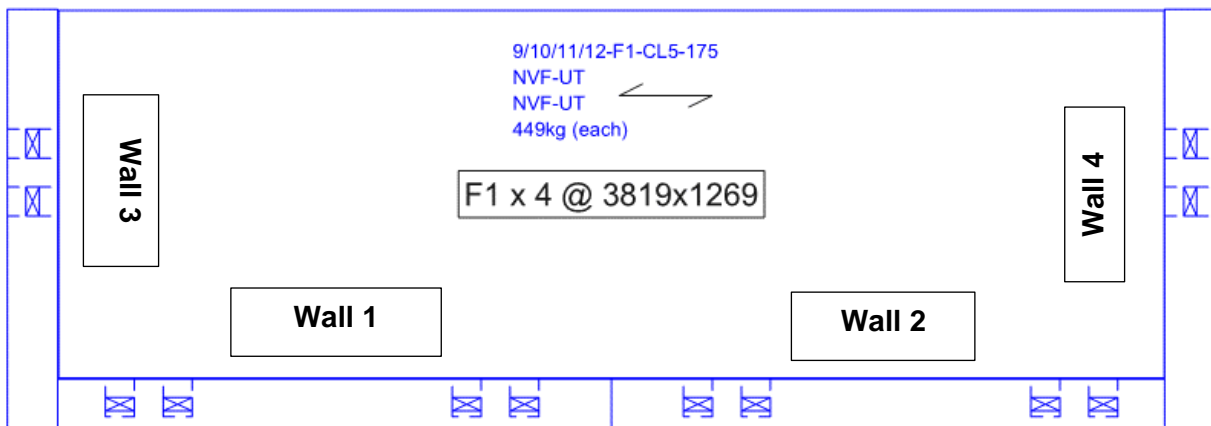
Plan view of core-wall specimen, image from XLam shop drawing
